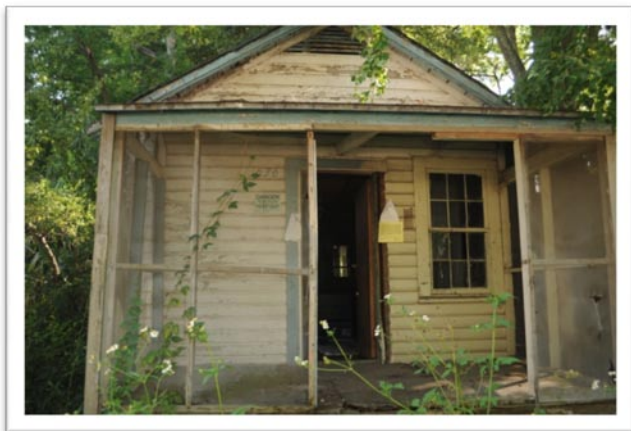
This house, on W. Tift Avenue between Washington and Jackson, has been identified as uninhabitable due to unsafe plumbing hazards.
